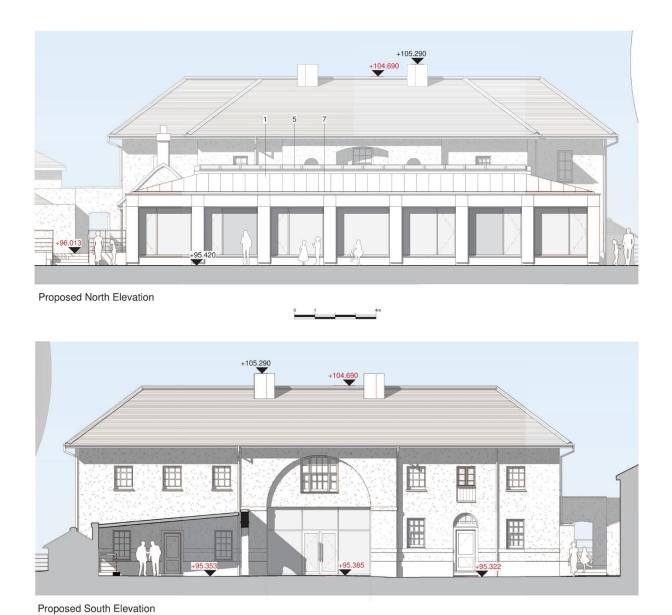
Stable Block: proposed front and rear elevations (scale as shown)
